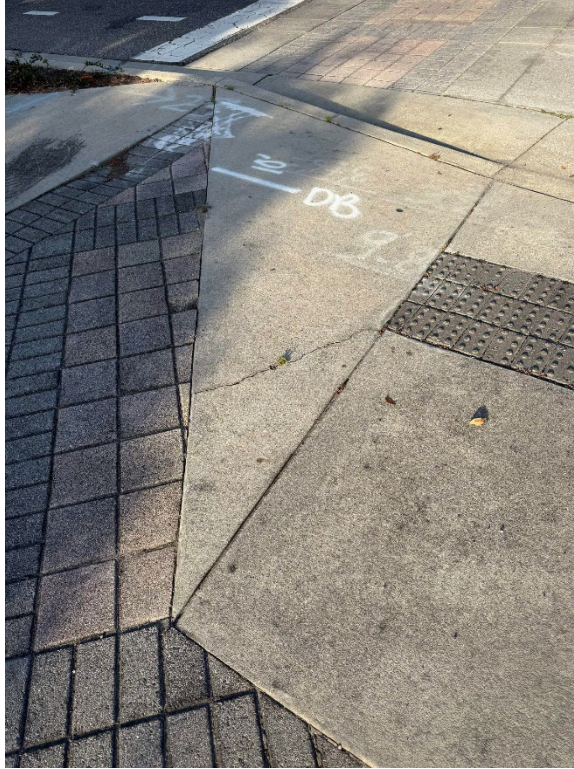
Surficial Concrete Cracks and Spalling in Handicap Ramp
